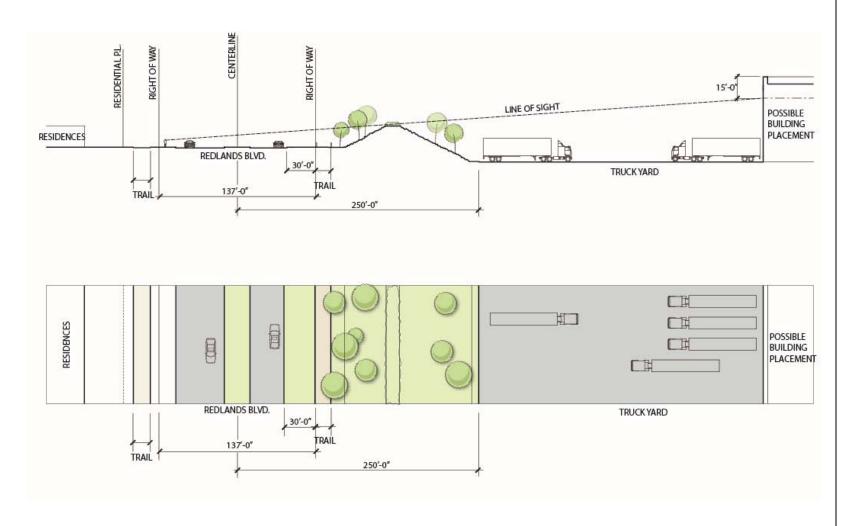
, 4-8 Redlands Blvd. Section C and Plan View C (pg.4-8)
